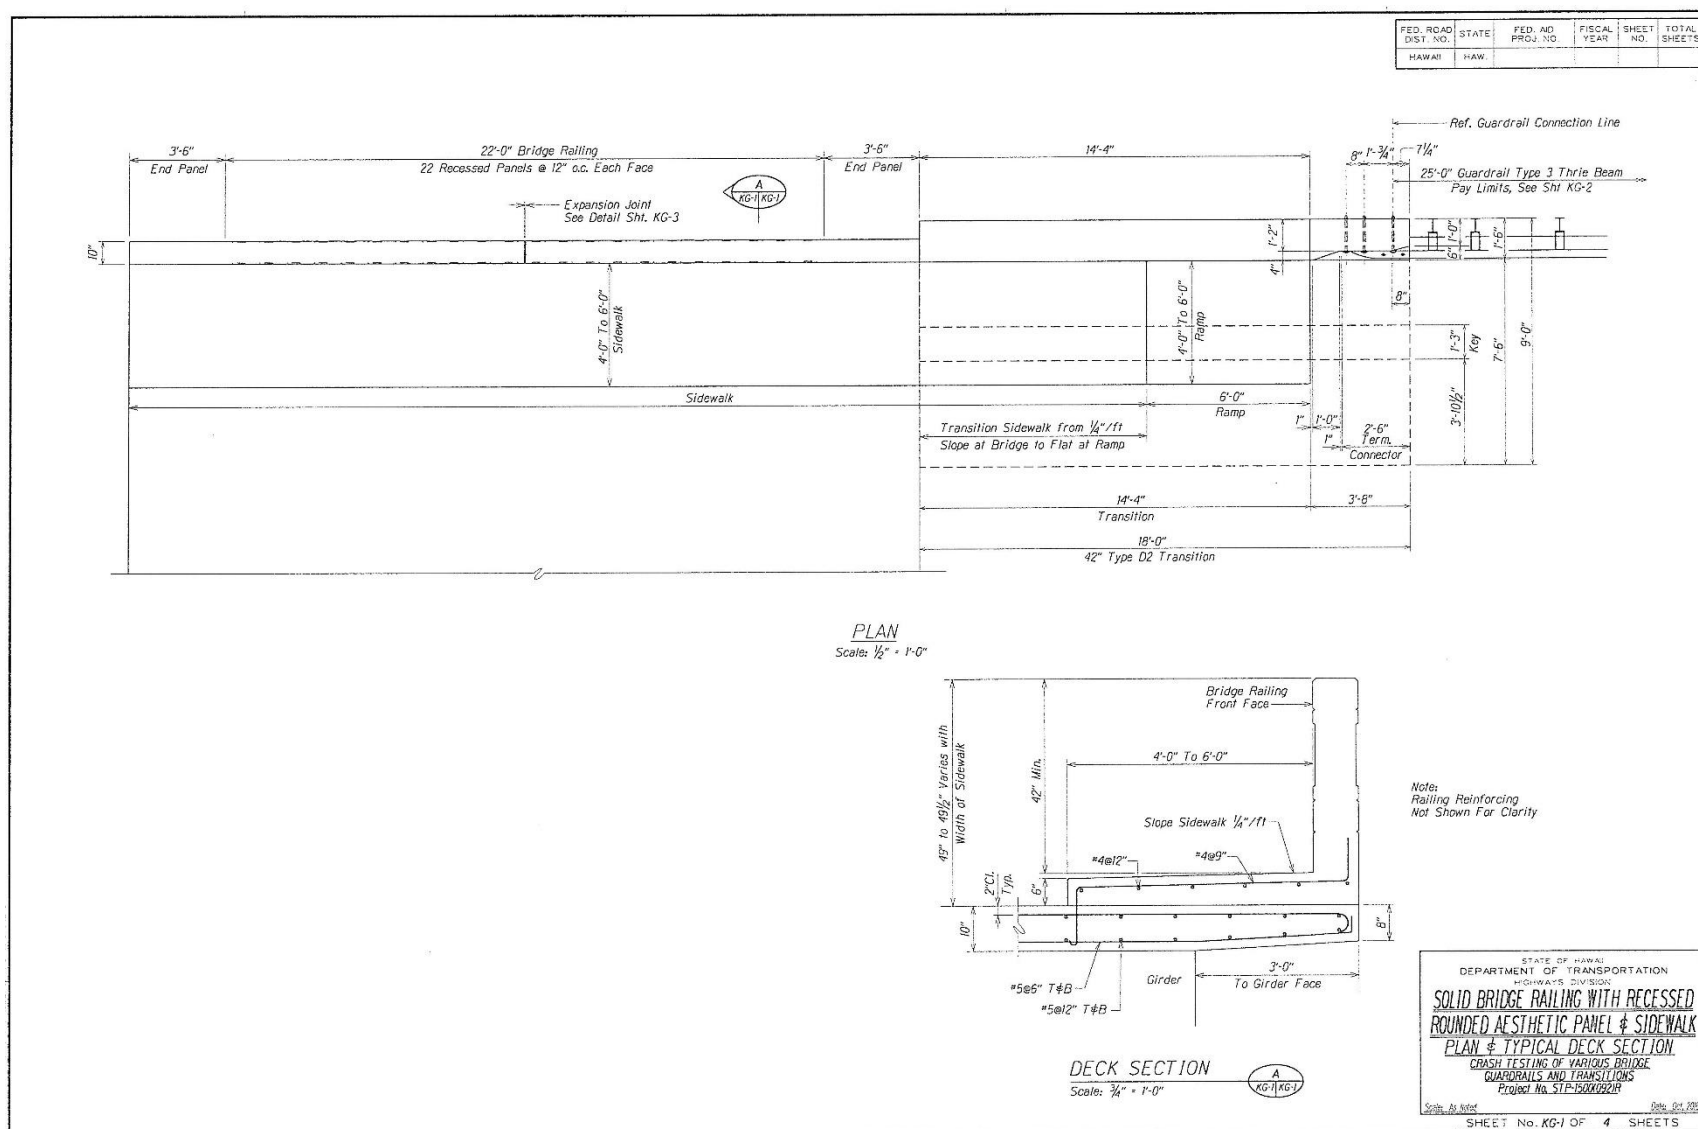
HDOT Standard Detail for 42-in. Tall, Aesthetic Concrete Bridge Rail [1]
